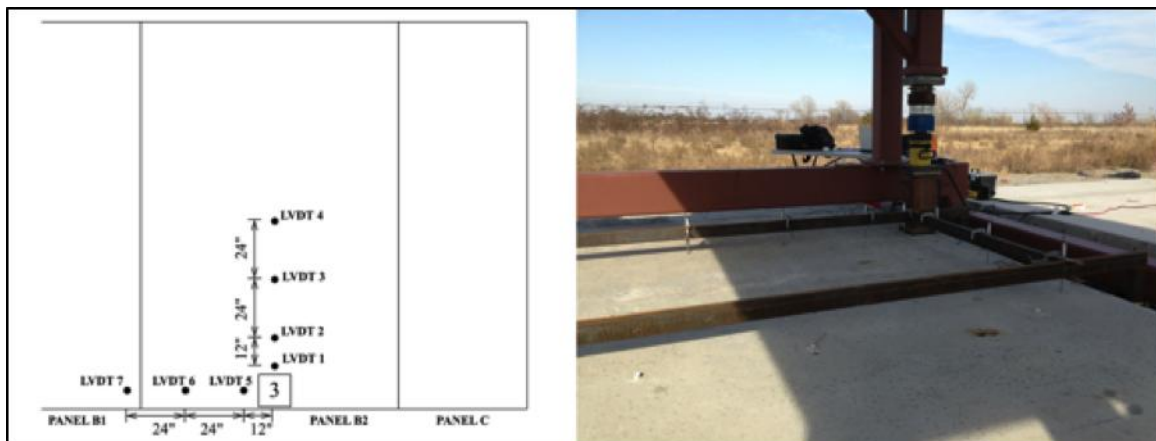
Instruments Layout at Test Location 1 for Test Pavement III. Test Location 3 is located at the edge of Panel B2. The instruments layout is similar to other panels.
